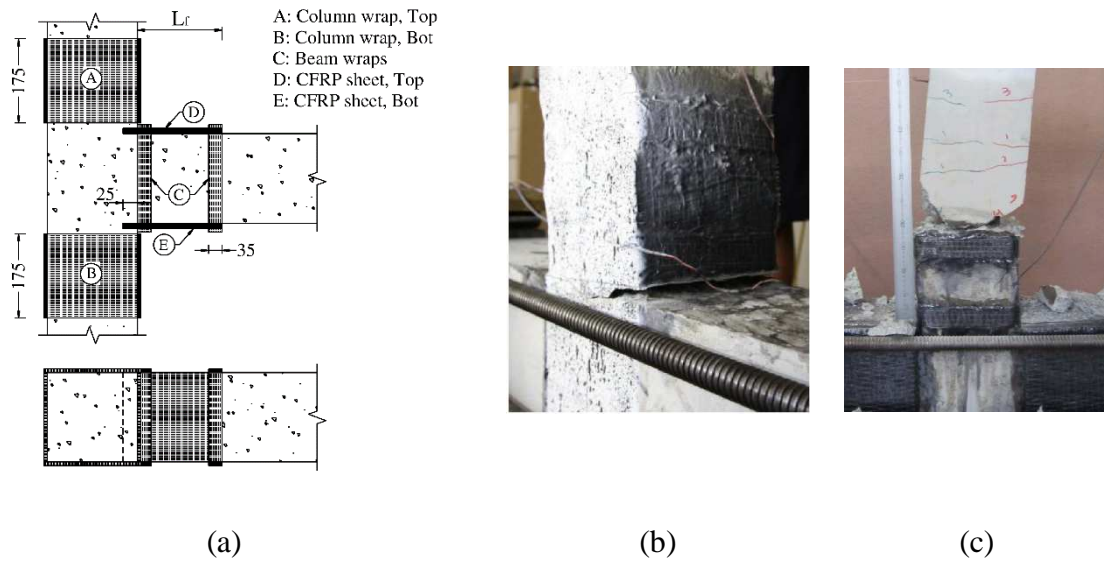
Retrofitting of exterior beam-column joints investigated by Eslami and Ronagh [102], (a) proposed retrofitting technique with beams longitudinal FRP anchored into a grooved carved in the concrete cover of the column, (b) concrete failure at the carved location in the absence of column FRP wraps (monotonic loading), (c) columns wraps prevented failure at the carved concrete location, and the flexural plastic hinge that formed on the beam (cyclic loading)
